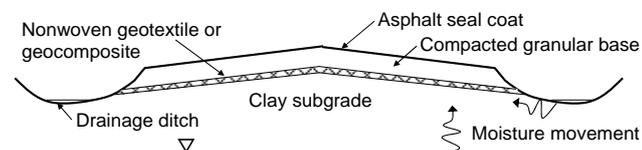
Nonwoven geotextile used as a hydraulic barrier in a flexible pavement
